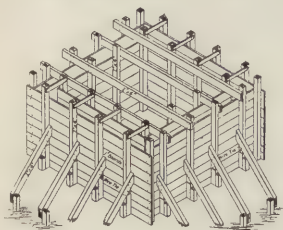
Forms and Bracing Required for Concrete Tank Construction.
